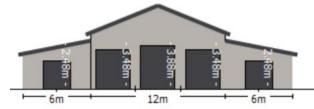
Outbuilding elevation – Riviera Barns and Garages
